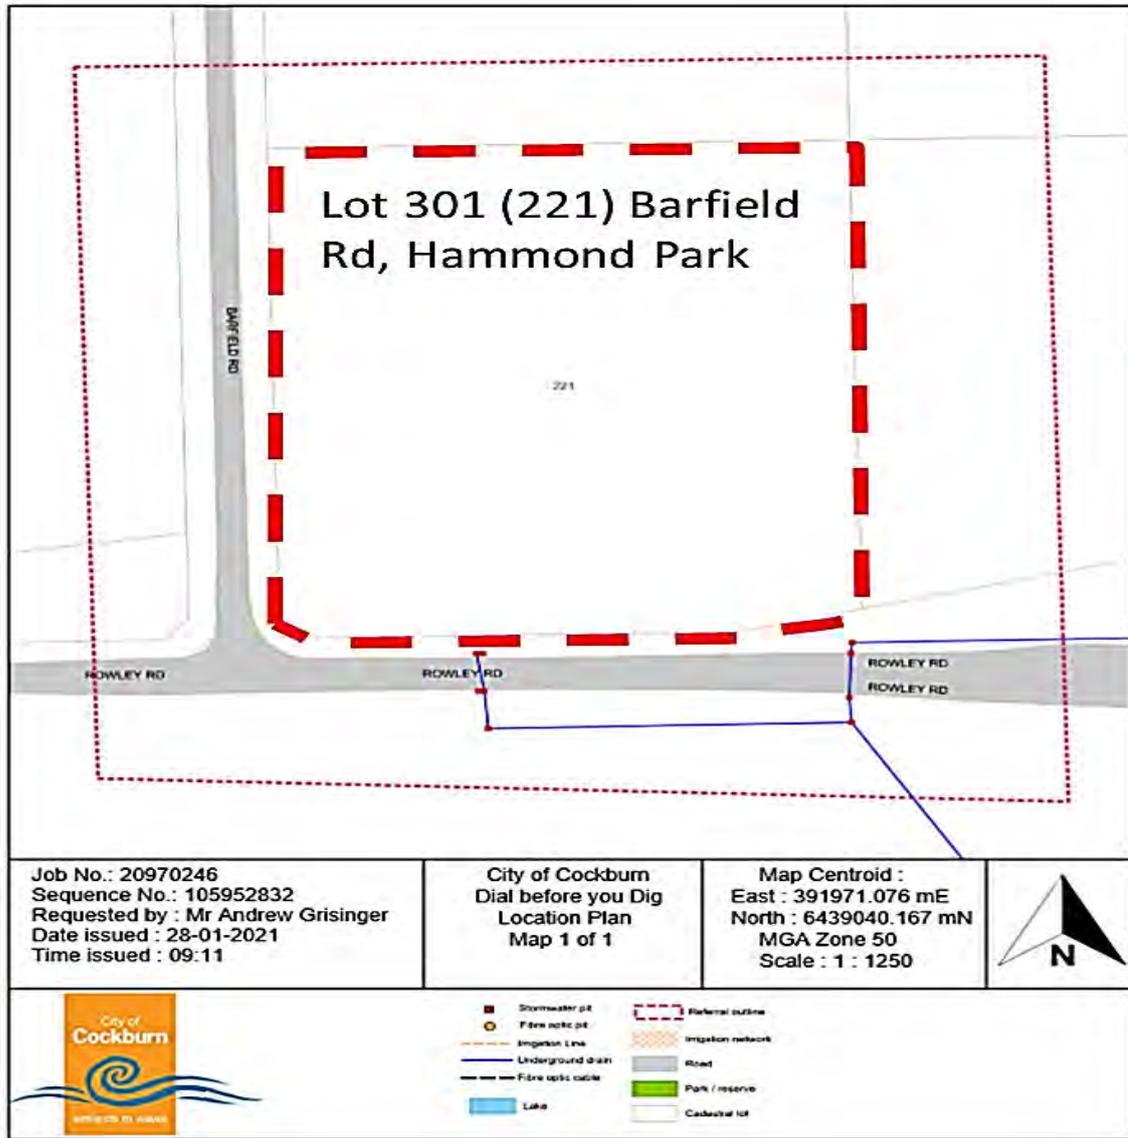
Existing Stormwater Infrastructure at Lot 301 (221) Barfield Road, Hammond Park
